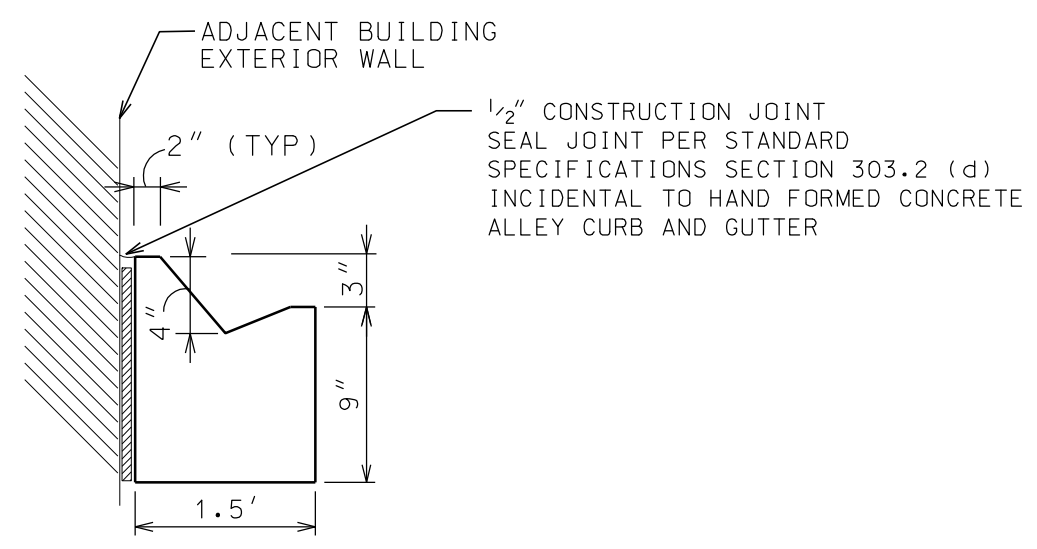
DETAIL - HAND FORMED CONCRETE ALLEY CURB AND GUTTER @ EXISTING CONCRETE SLABS
